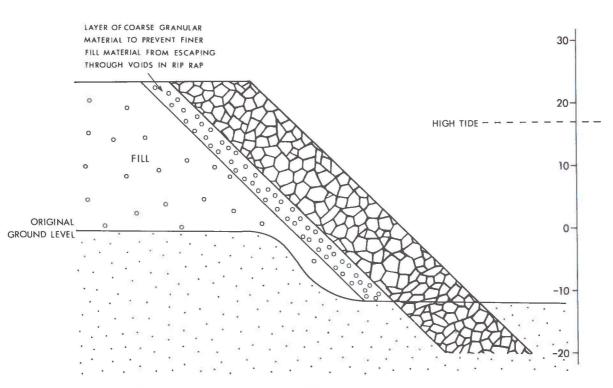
Typical Profile of Rip Rap Placed After Fill.
